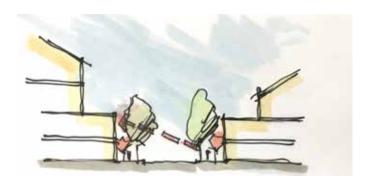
Maintain a two-storey street wall along Cordova Bay Road
